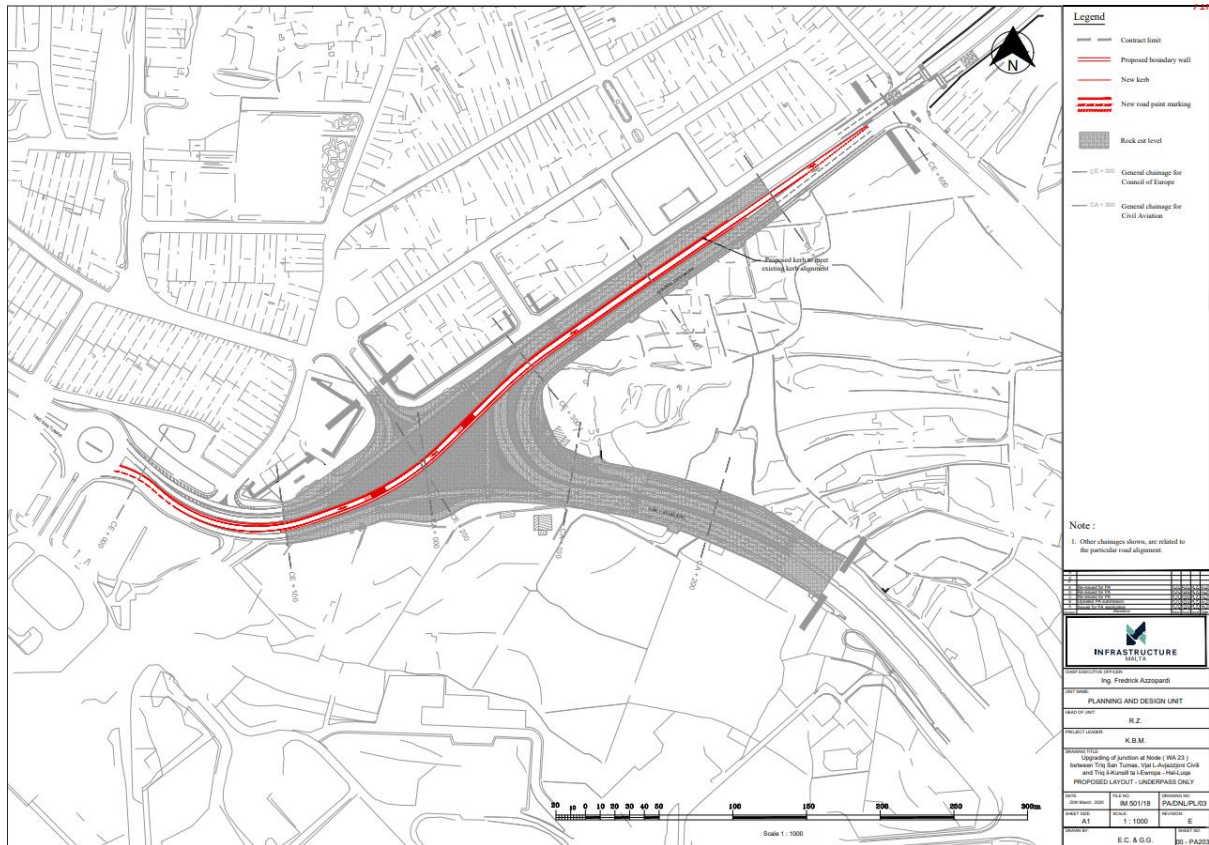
v: Proposed underpass (tunnel) (Source: PA/04721/20 – 71h on EApps)
